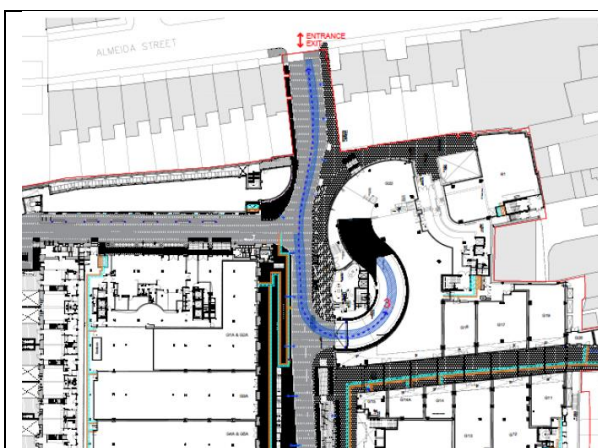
Proposed street level access route to the existing commercial servicing yard in the basement beneath Block C
